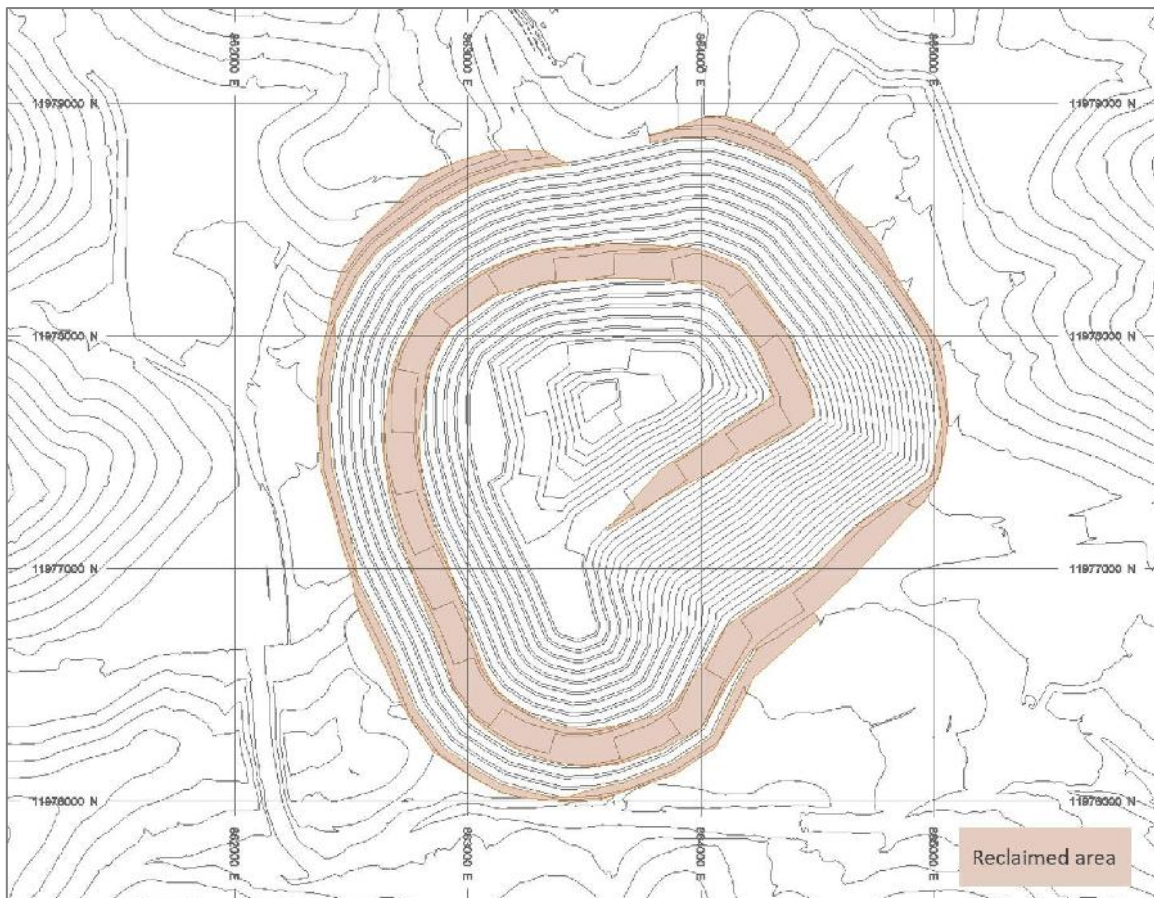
2017 MORP Pit Showing Expanded 4900 Catch Bench and Pit Surfaces Scheduled for Cover
